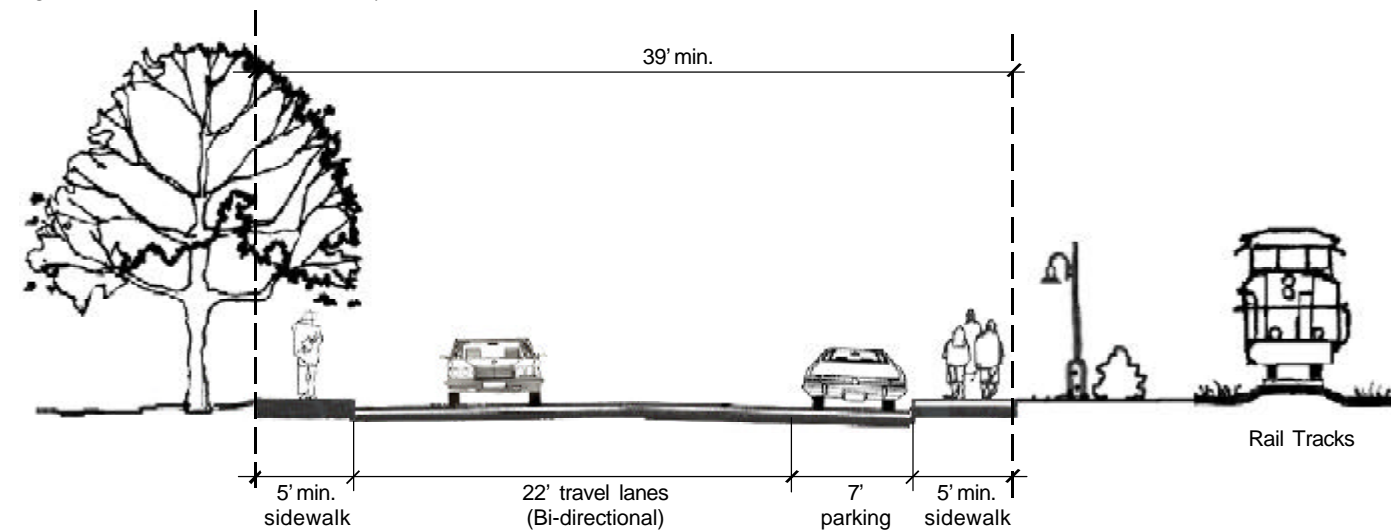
Road Section J -- Entry Road North of Gross Kelly Co. Warehouse
